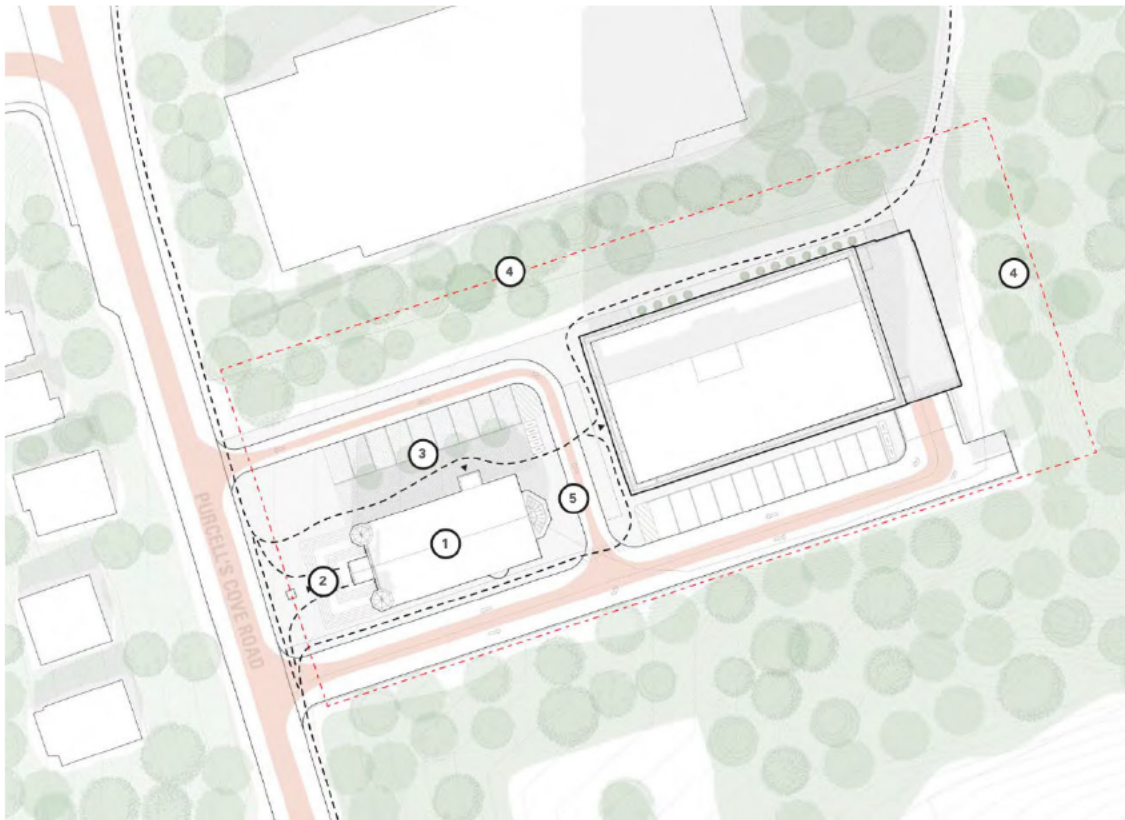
Development Proposal – Site Plan illustrating relocation of the former St. John the Baptist Church and residential tower behind. Source: FBM Architects
